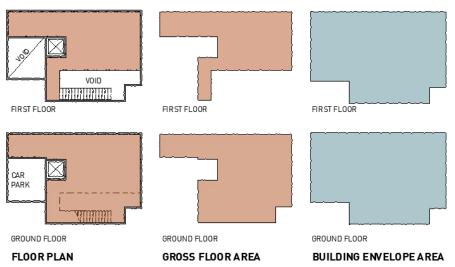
GROSS FLOOR AREA VS BUILDING ENVELOPE AREA
